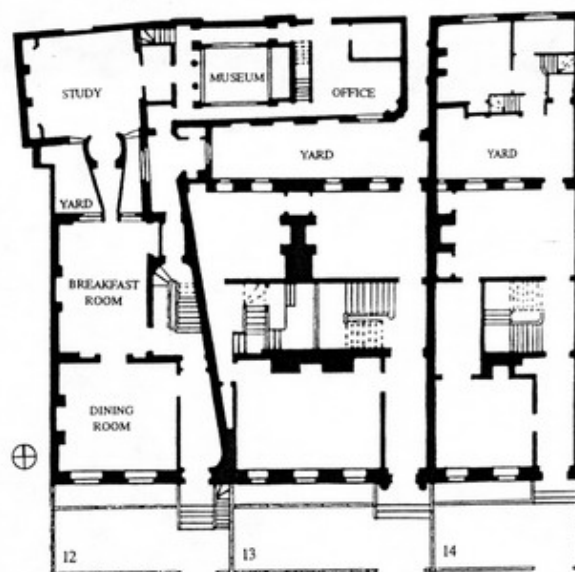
12-14 Lincoln's Inn Fields. Ground-floor plan as existing about 1809 (author, based on Museum documents and guidebook plans).
